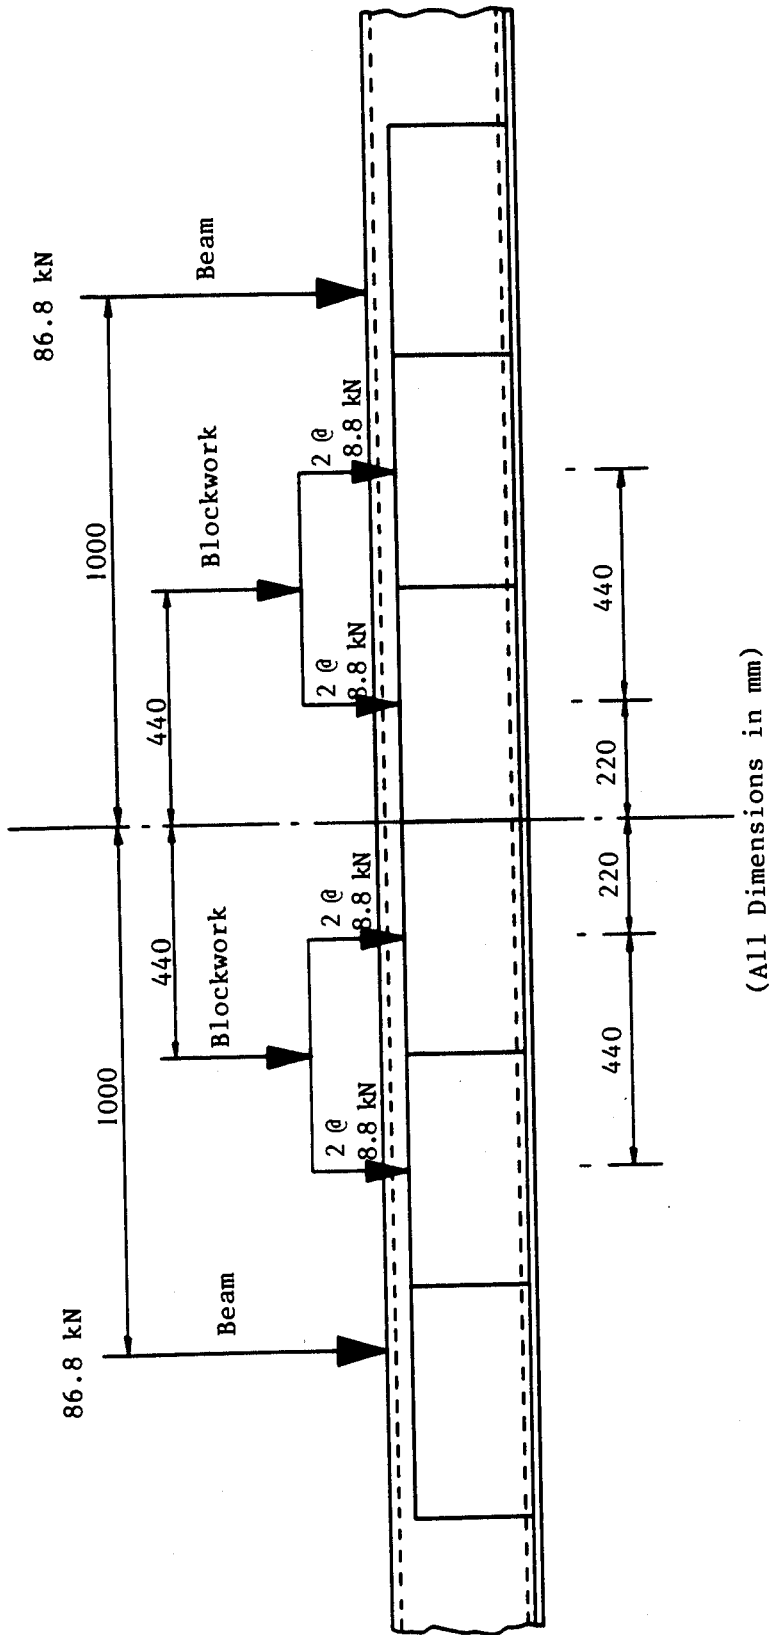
APPLIED LOAD POSITIONS - LONGITUDINAL ARRANGEMENT - TEST NO. WFR 52897 (R4/36)
